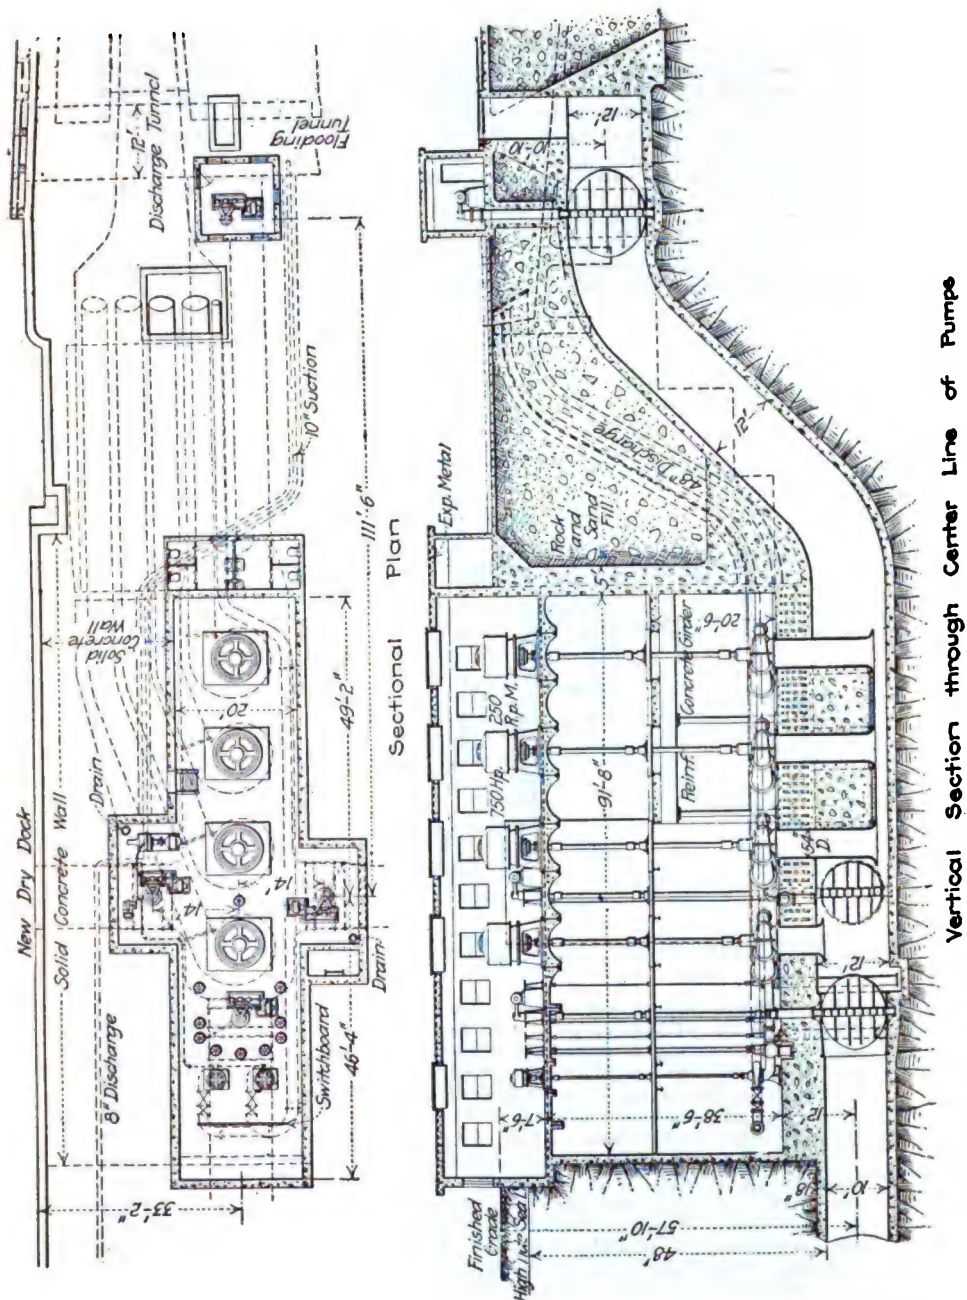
SECTION THROUGH AND PLAN OF PUMP HOUSE, SAN FRANCISCO DRY DOCK.
